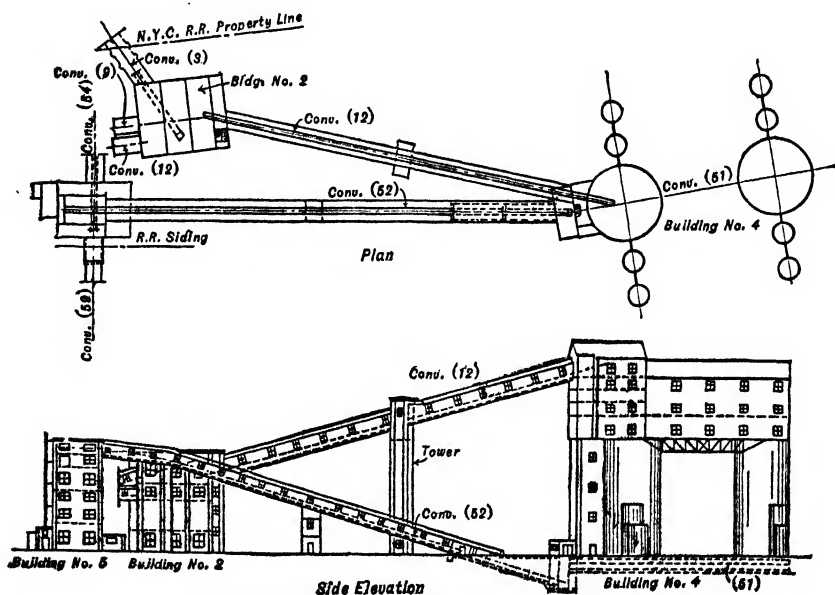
Arrangement of silos and wash house; plant of Fig. 76.
